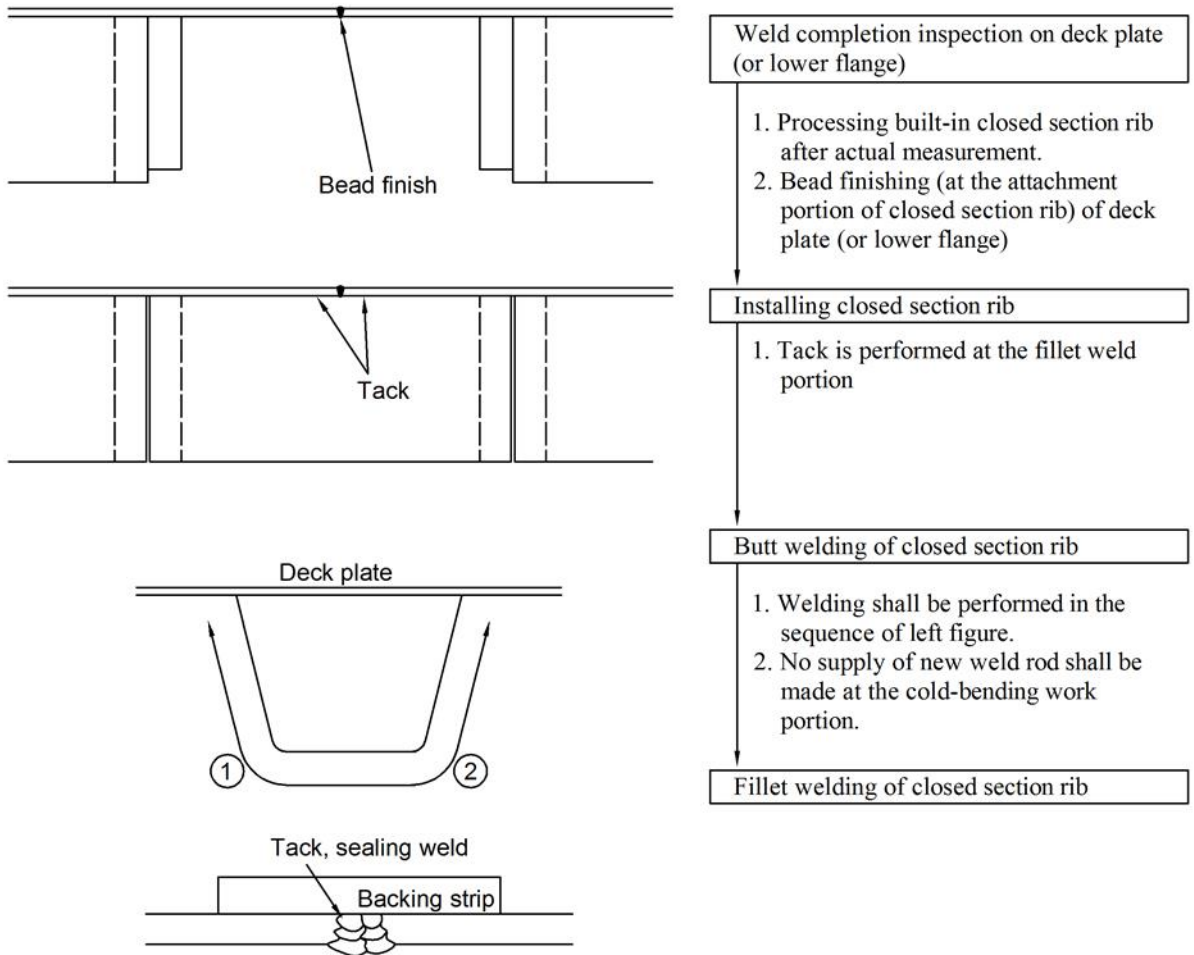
Example of Working Instruction on Site Welding of Closed Section Rib
